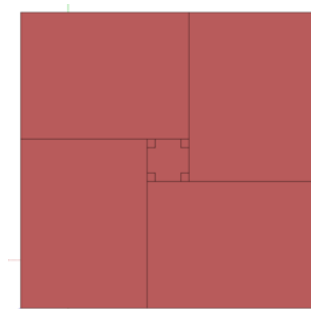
MULTI-FAMILY VENTILATION MODEL FLOOR PLAN
